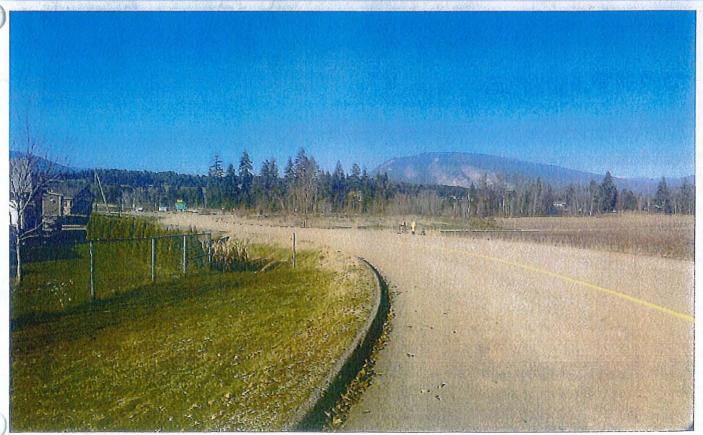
Photo looking north from 51 Street NE showing overview and frontage road.
